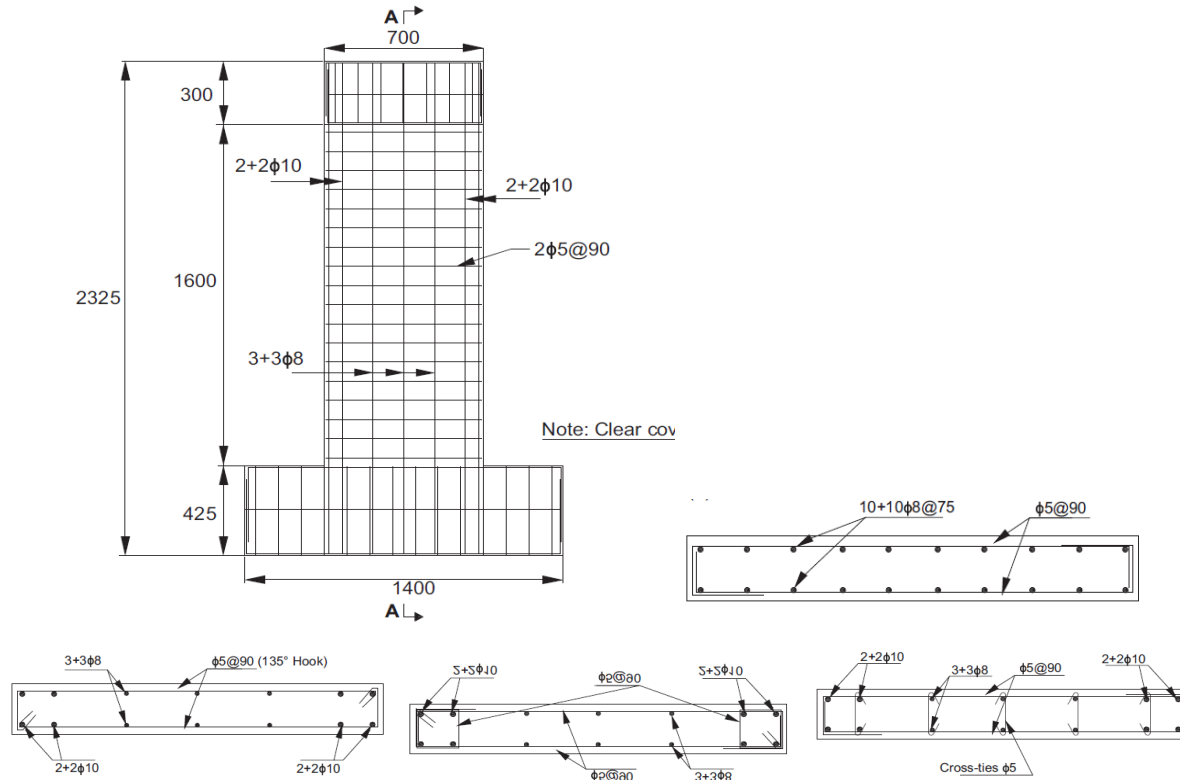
Dimensions and reinforcement details of wall specimens (Hube et al 2014).
